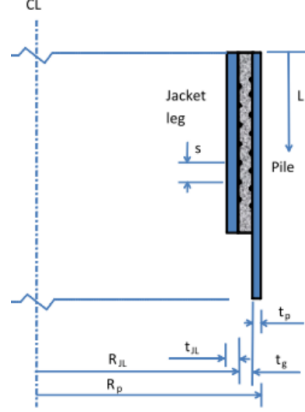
Schematic of the grout connection of a pre-installed pile with a jacket leg
